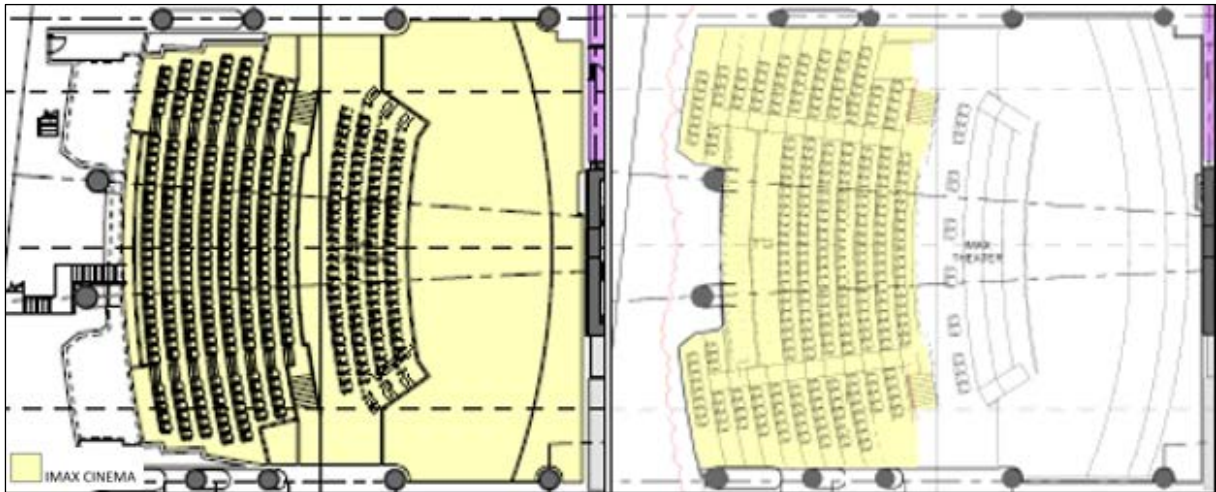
| Existing (left) and proposed (right) Level 3 layout (Source: Applicants EA)
